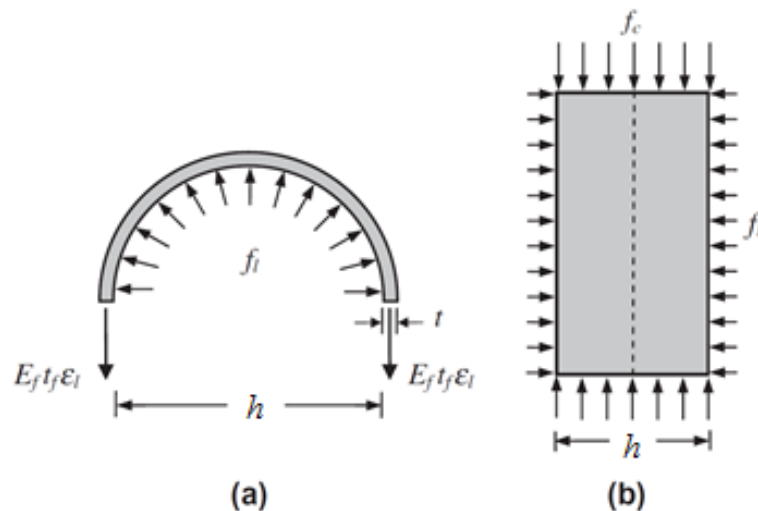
Confining action of FRP on concrete core: (a) FRP; (b) concrete core⁸⁷
